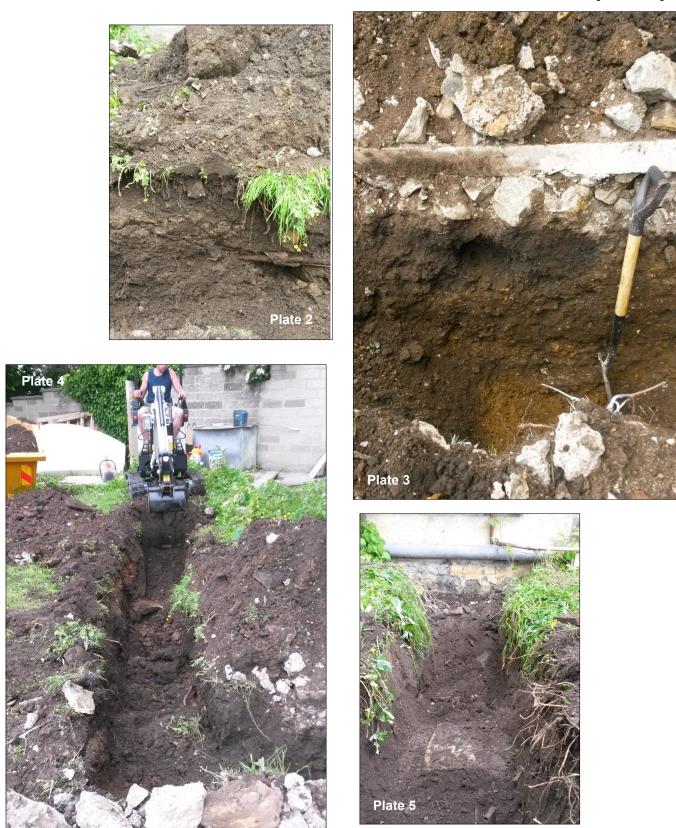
North facing section of the east-west trench, a cable is visible bottom right hand corner.
